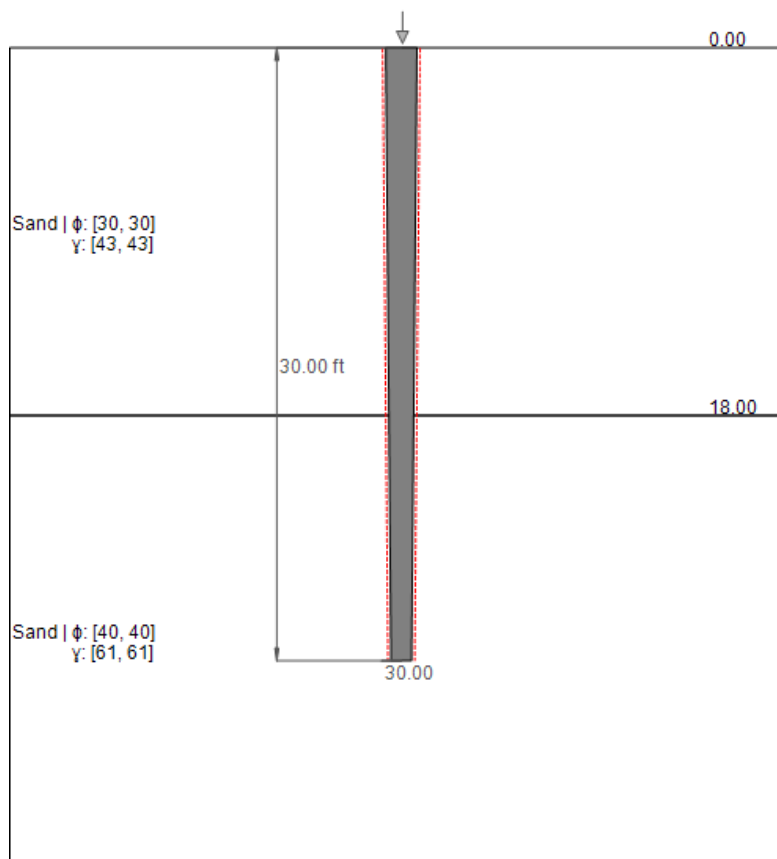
Pile layout and soil conditions of Example Problem 5.
